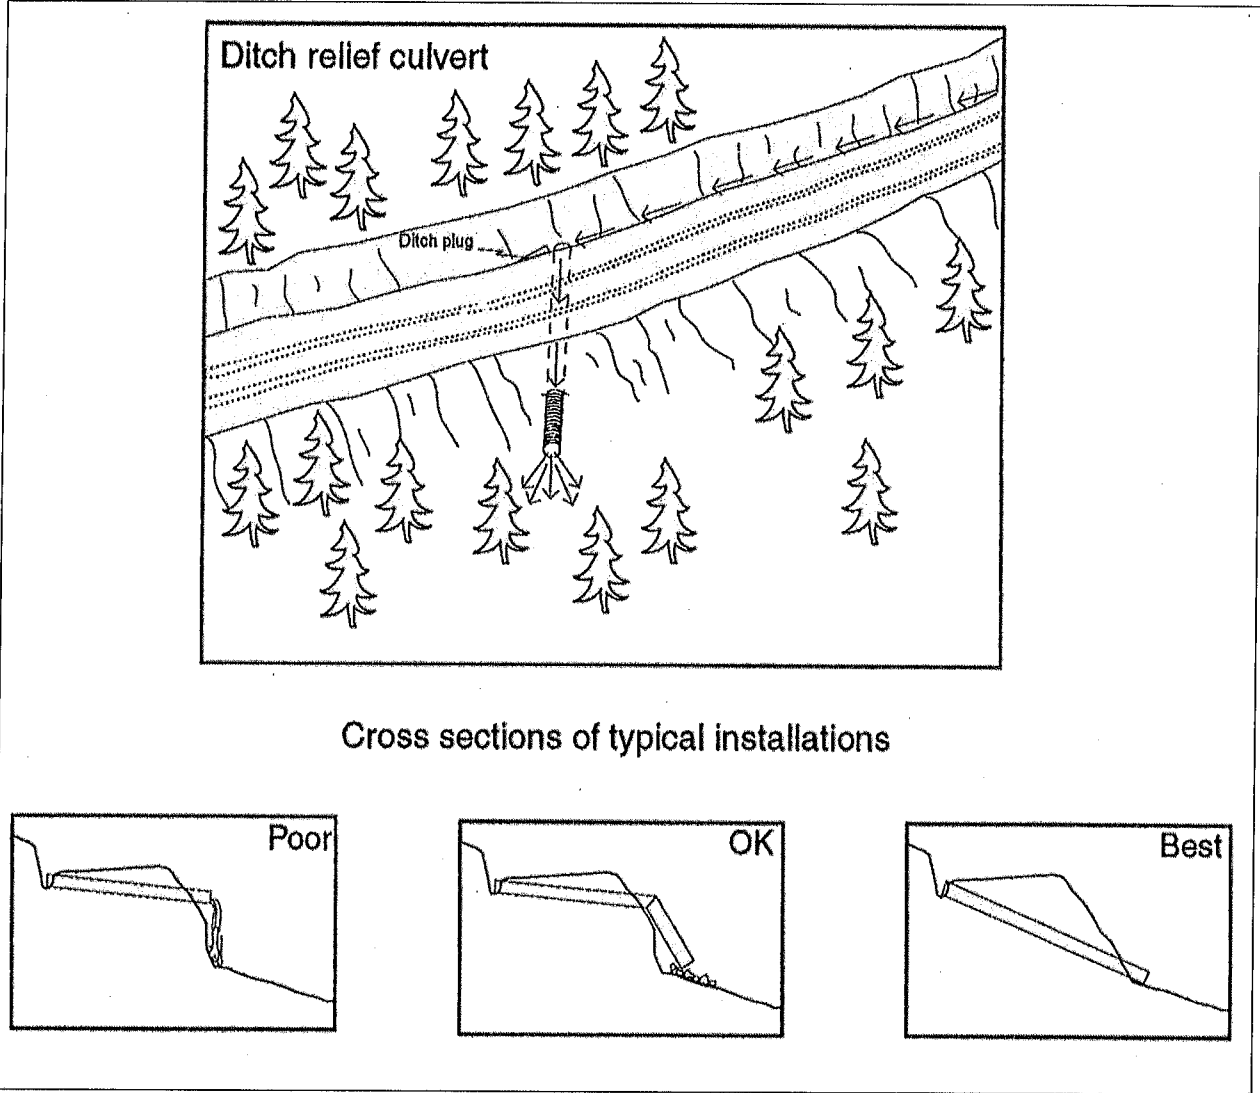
Typical ditch relief culvert installation. From CDFG (2002).
